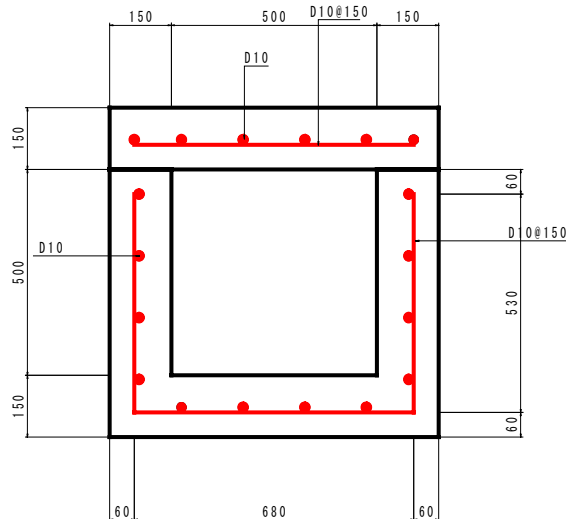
Road Crossing Section in Khettara Lambarkia
